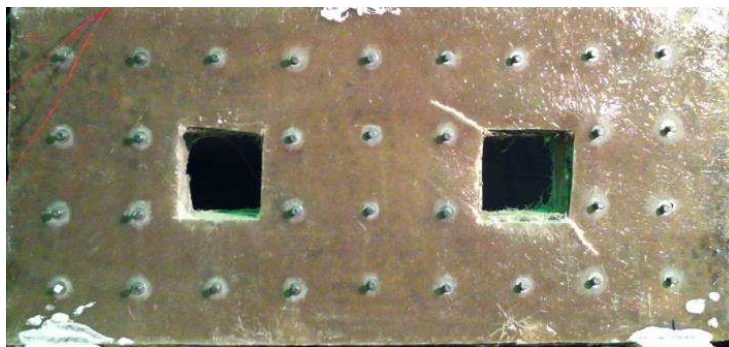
Failure mode of Beam specimen - Control LS-S12
